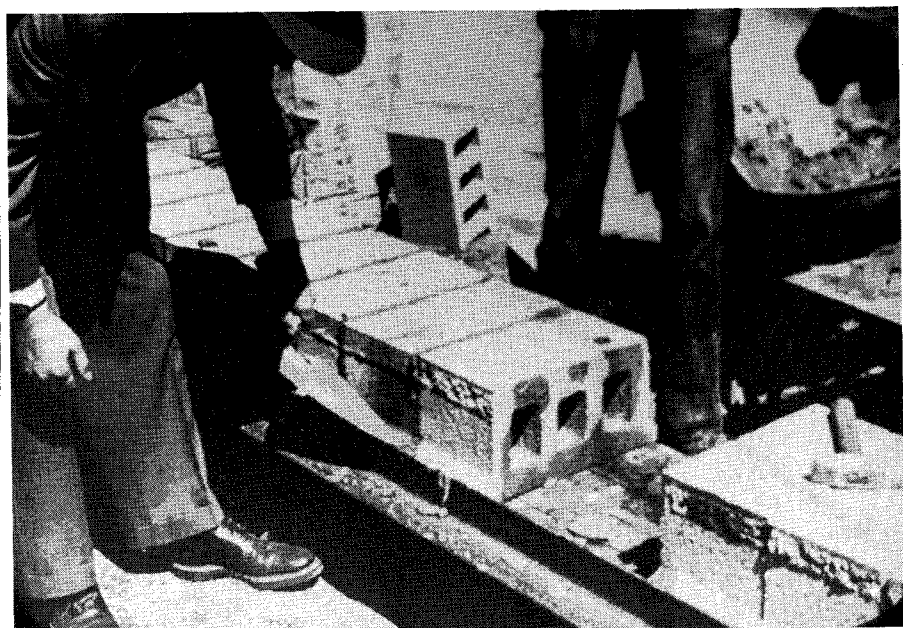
Fabricating 8-in. (203 mm) block building beam.
